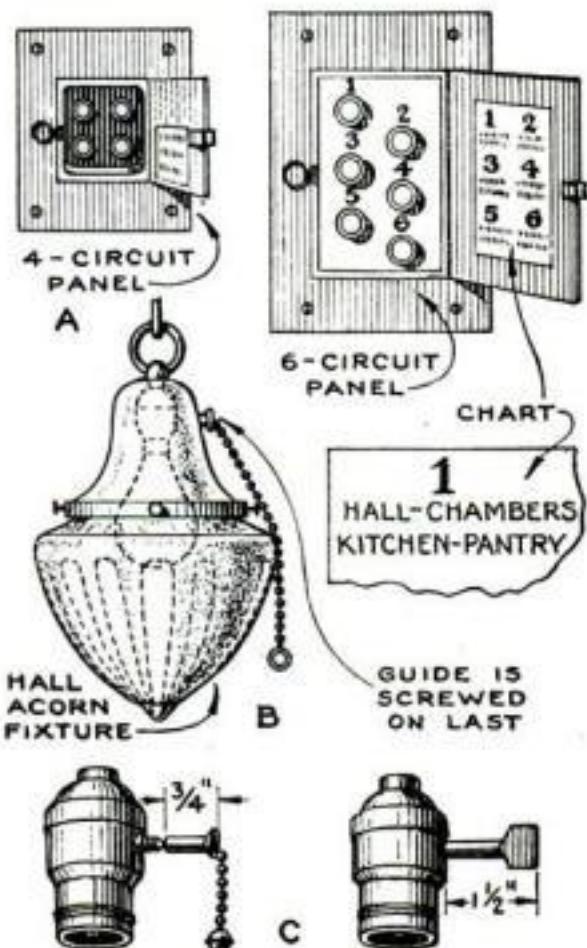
Convenient hall fuse-panel boards, an extension chain guide, and a long key.
